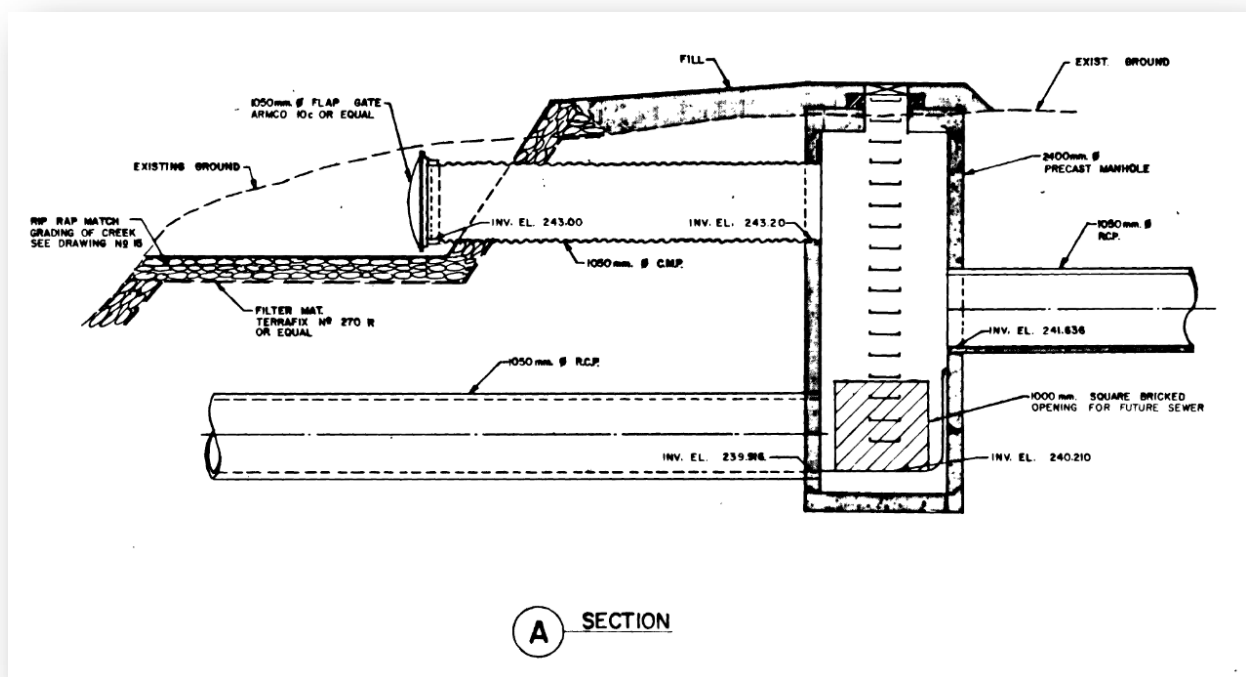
Pipe Section and Elevations of the Outfall Pipe and Flap Gate at the Aurora Sewage Pumping Station Outfall (see drawing provided in Appendix B)
